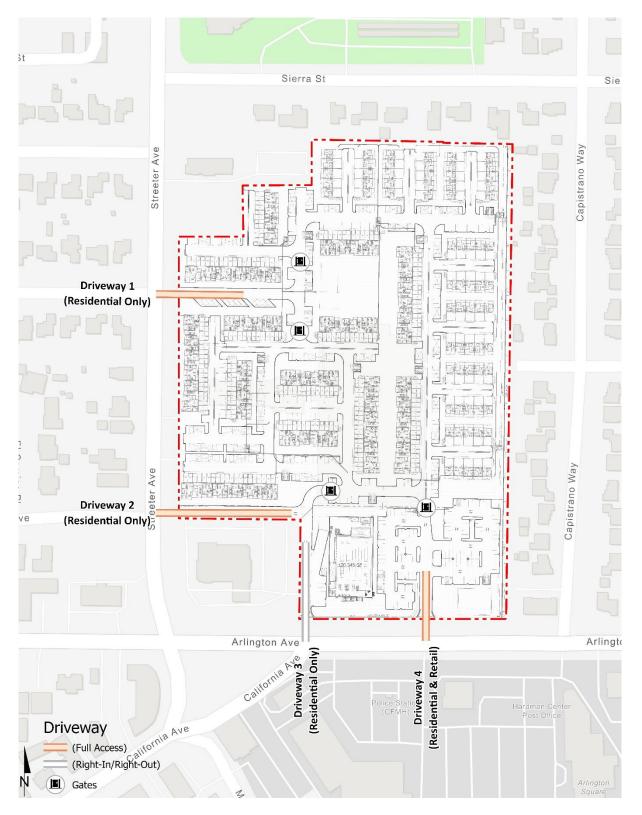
PRELIMINARY SITE PLAN
